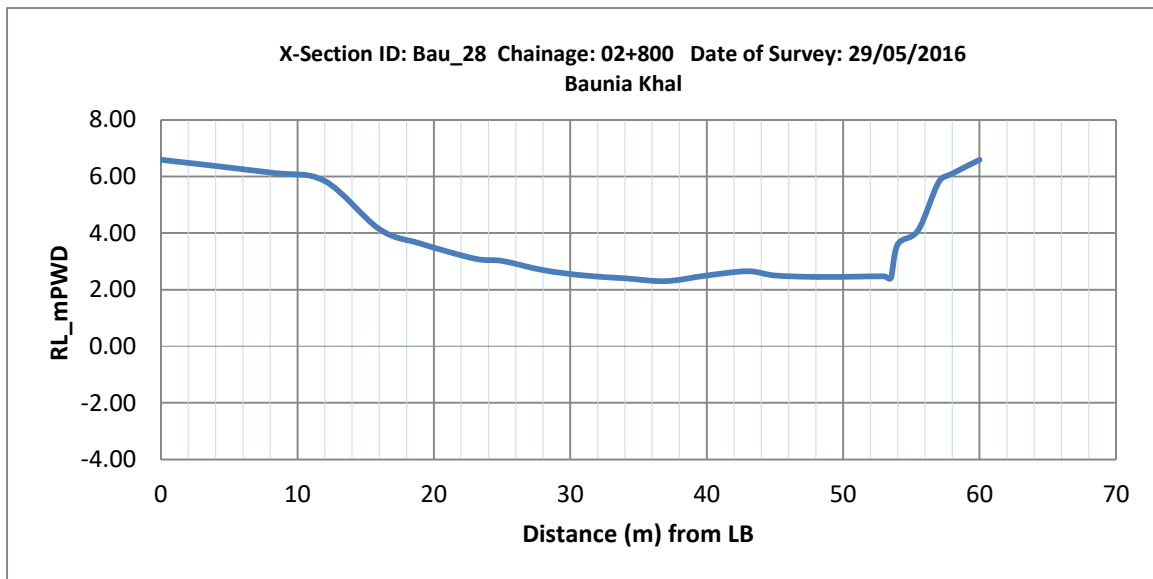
Matikata road near kalshi road (Bridge and canal cross section)
